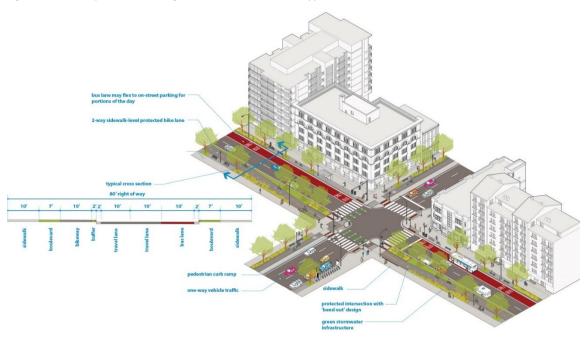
Minneapolis Street Design Guide, Downtown Core Typical Cross Section
